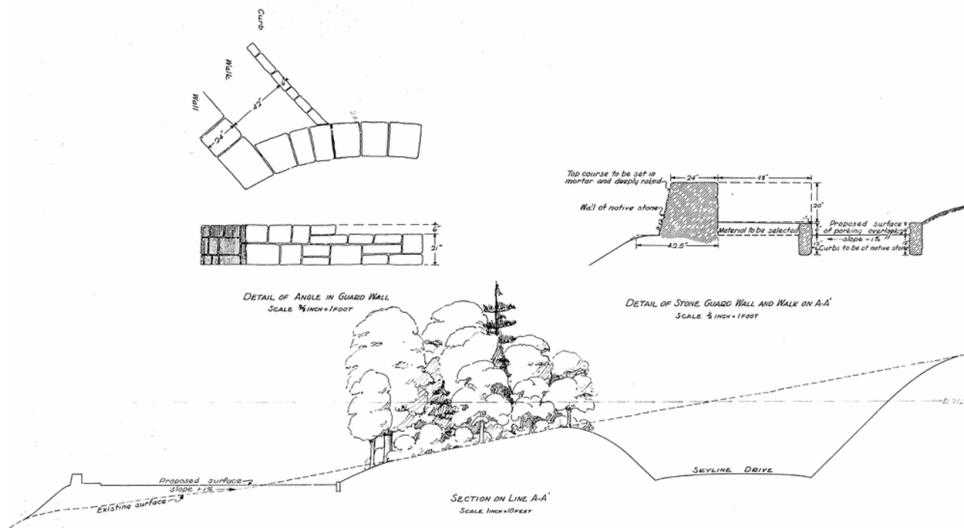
Detail and section of parking overlook and stone guardwall in the North District, 1934 (Denver Service Center, 134-1074-id76379).
